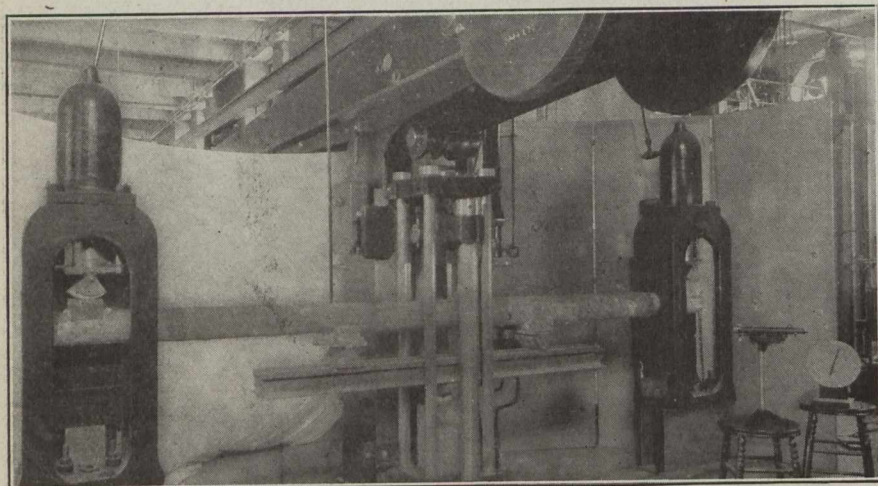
Wicksteed Testing Machine, Showing Method of Testing Mine Booms.
